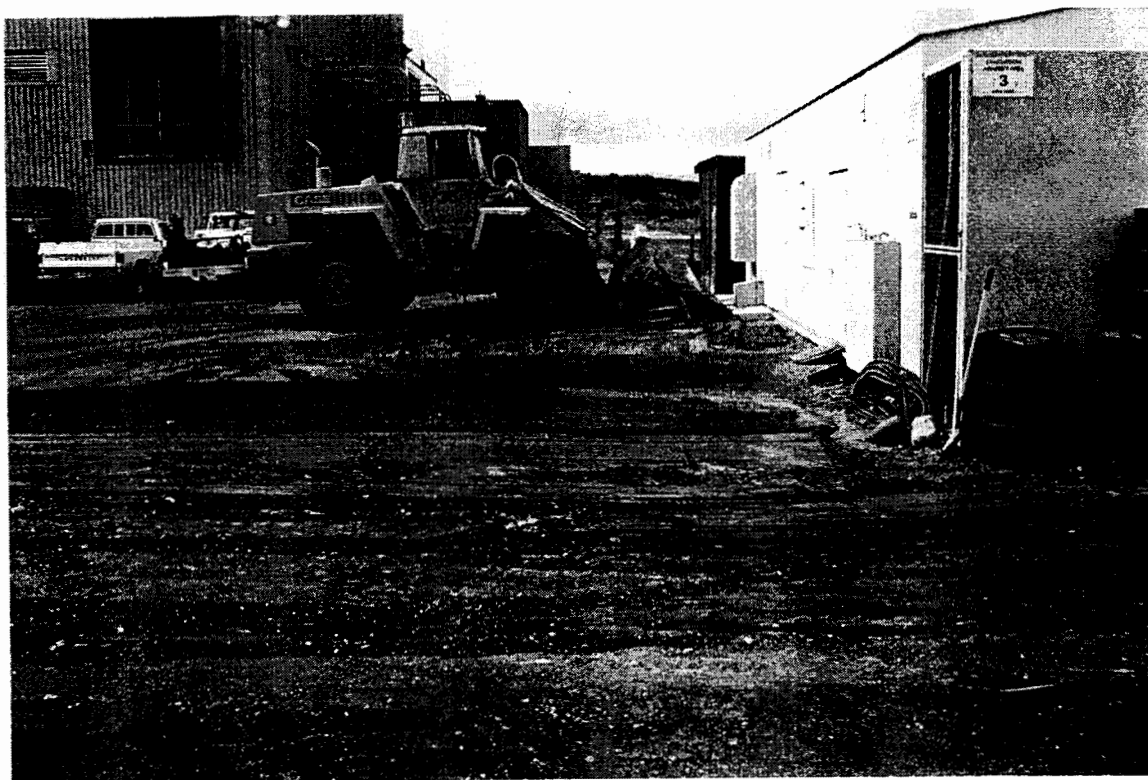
DEG Test Pit Area Backfill and Grading
